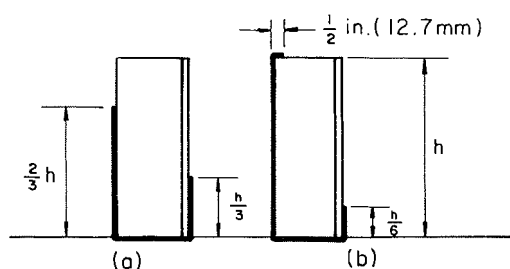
Details of welding for series D (a) and E (b) specimens.
